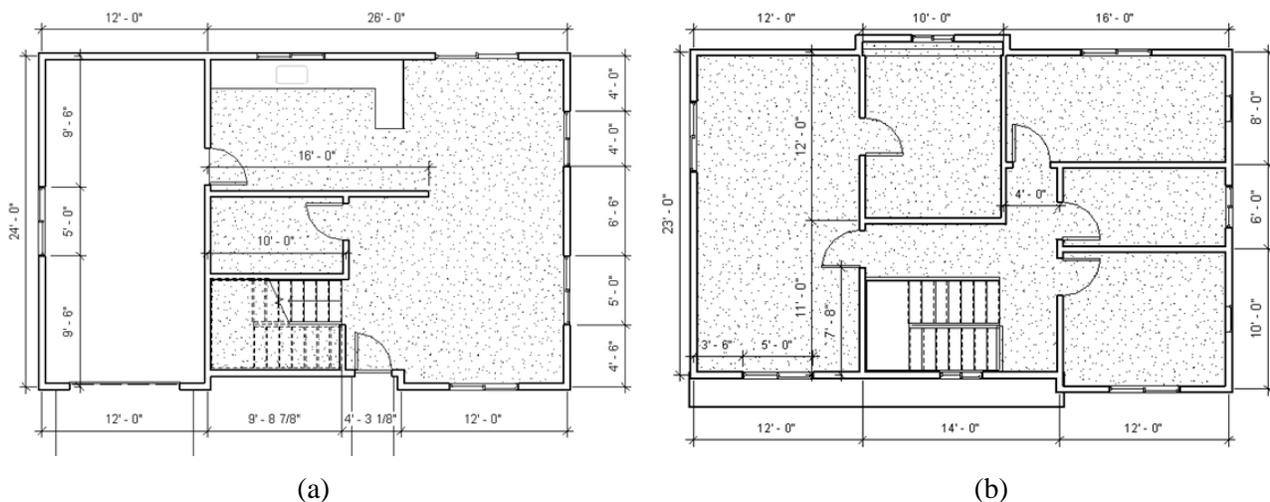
Full-scale wood-frame house test specimen: (a) first floor plan; (b) second floor plan [5]
